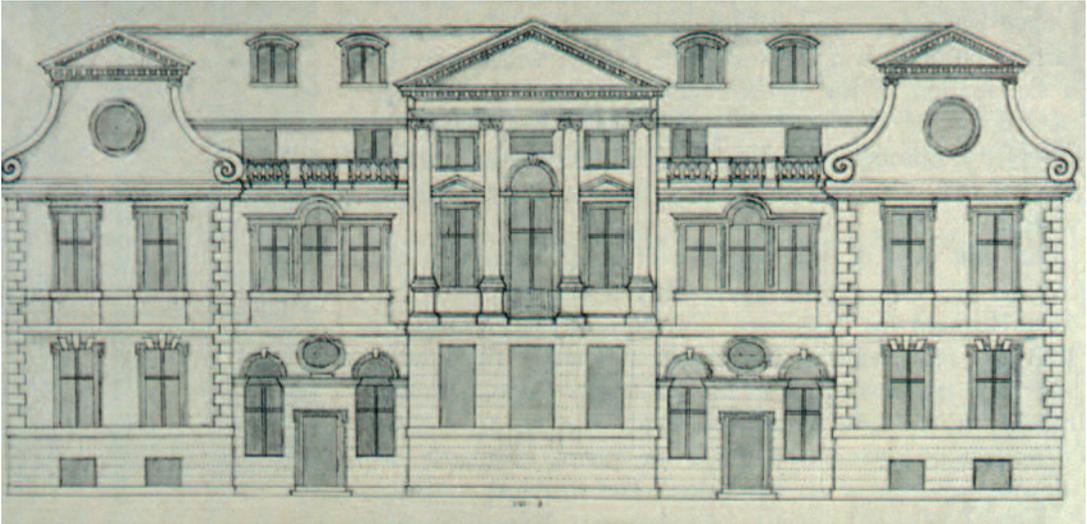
Raynham Hall, Norfolk: west elevation before 1699.
